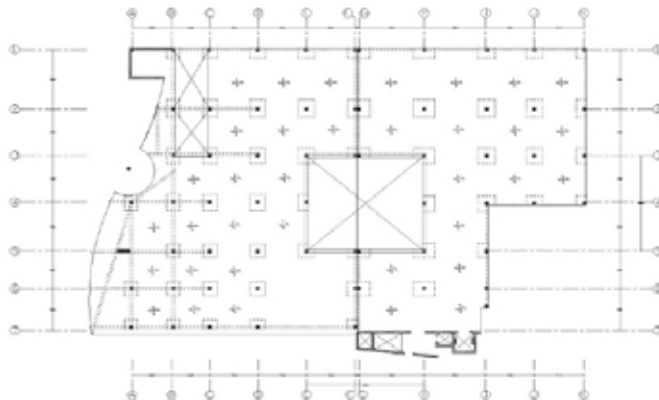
Column layout for the suggested flat slab construction of the flooring system of the typical floor
